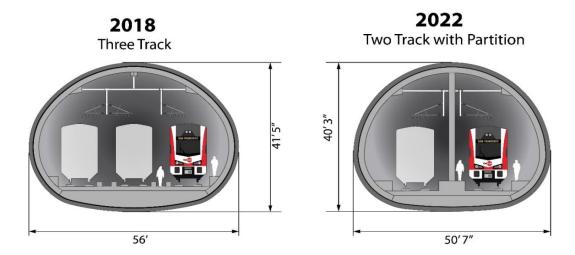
Cross Section of Proposed Two-Track Tunnel Segment Compared to Approved Three-Track Tunnel Segment
